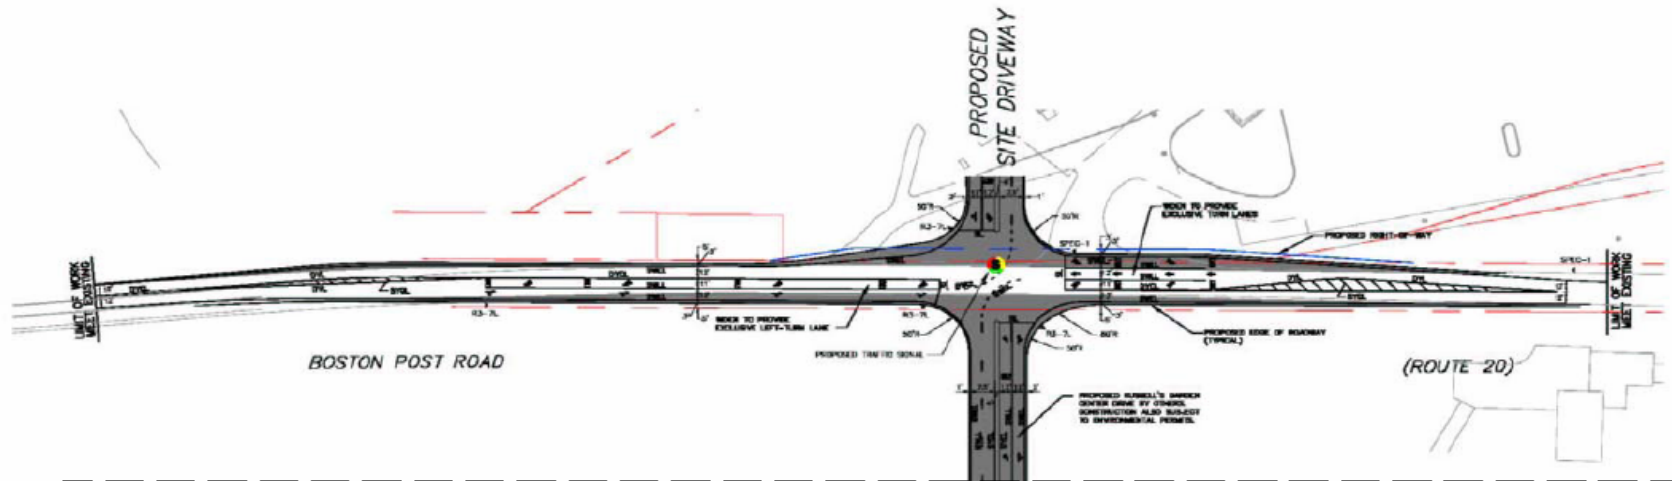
Preliminary Conceptual Improvement Plan - Wayland Town Center
